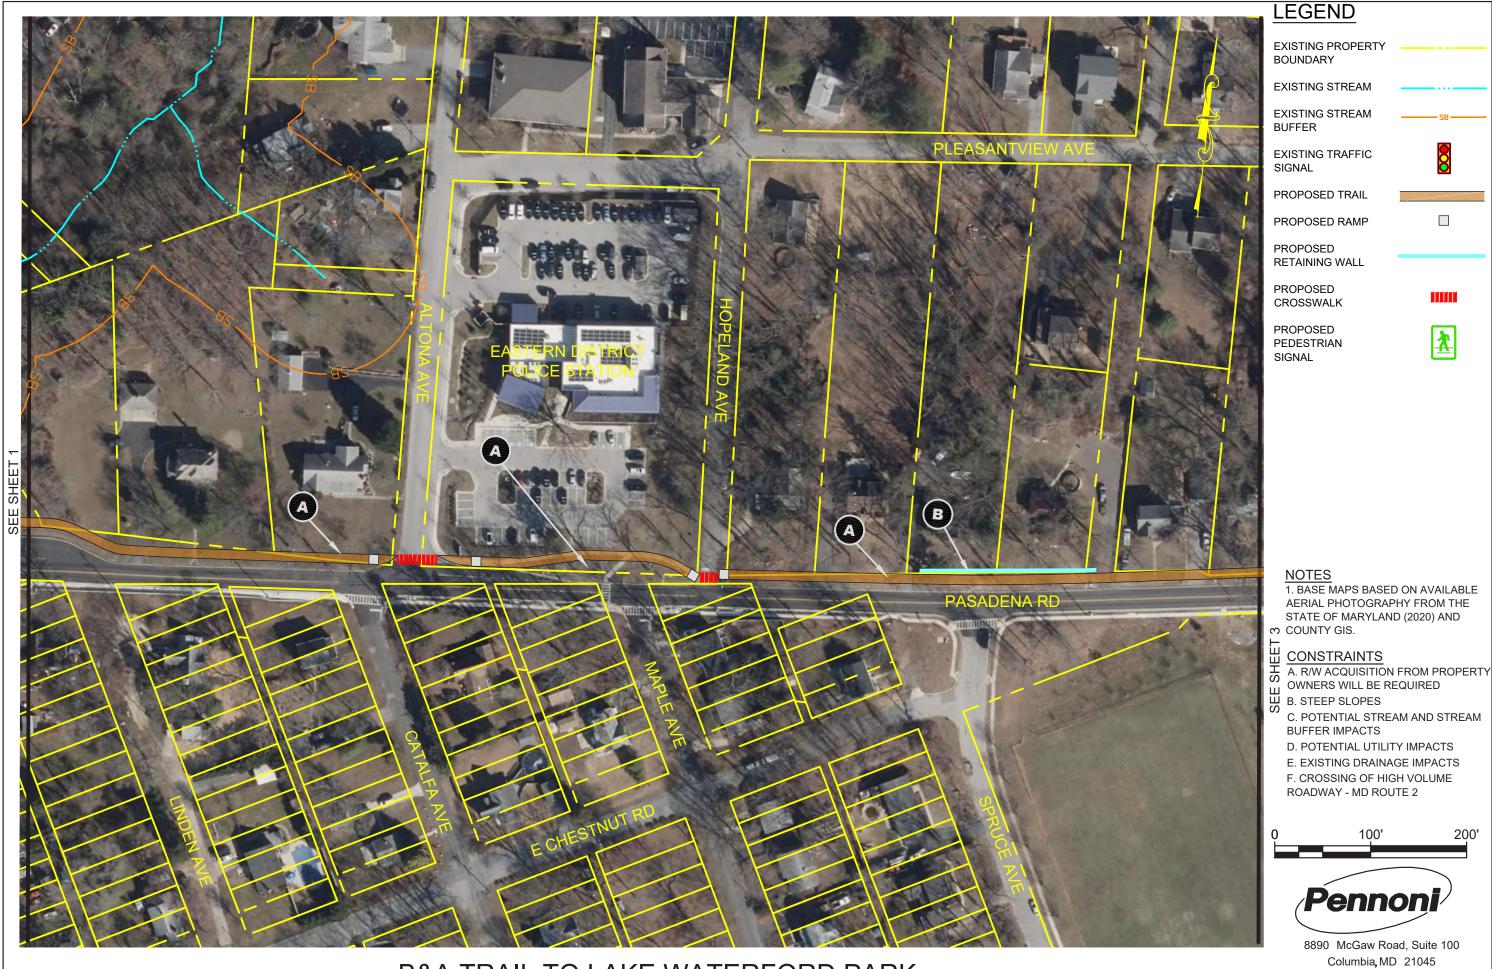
Pasadena Road and Ritchie Highway Intersection
